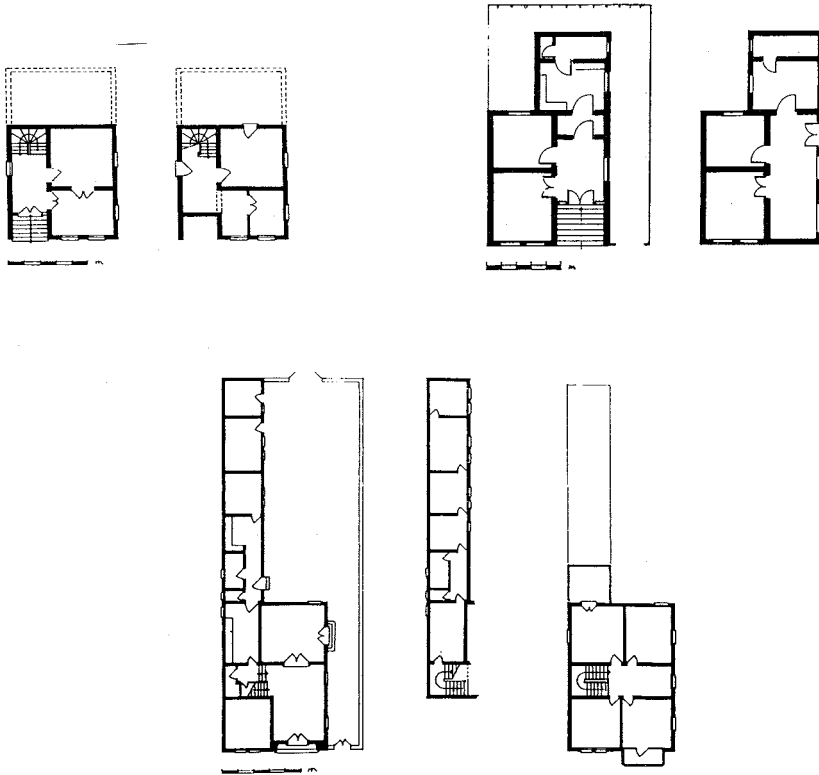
The Greek house: Houses of Buca. Typical plans of houses with basement floor (top), typical plan of two-storey house with balcony (bottom).
